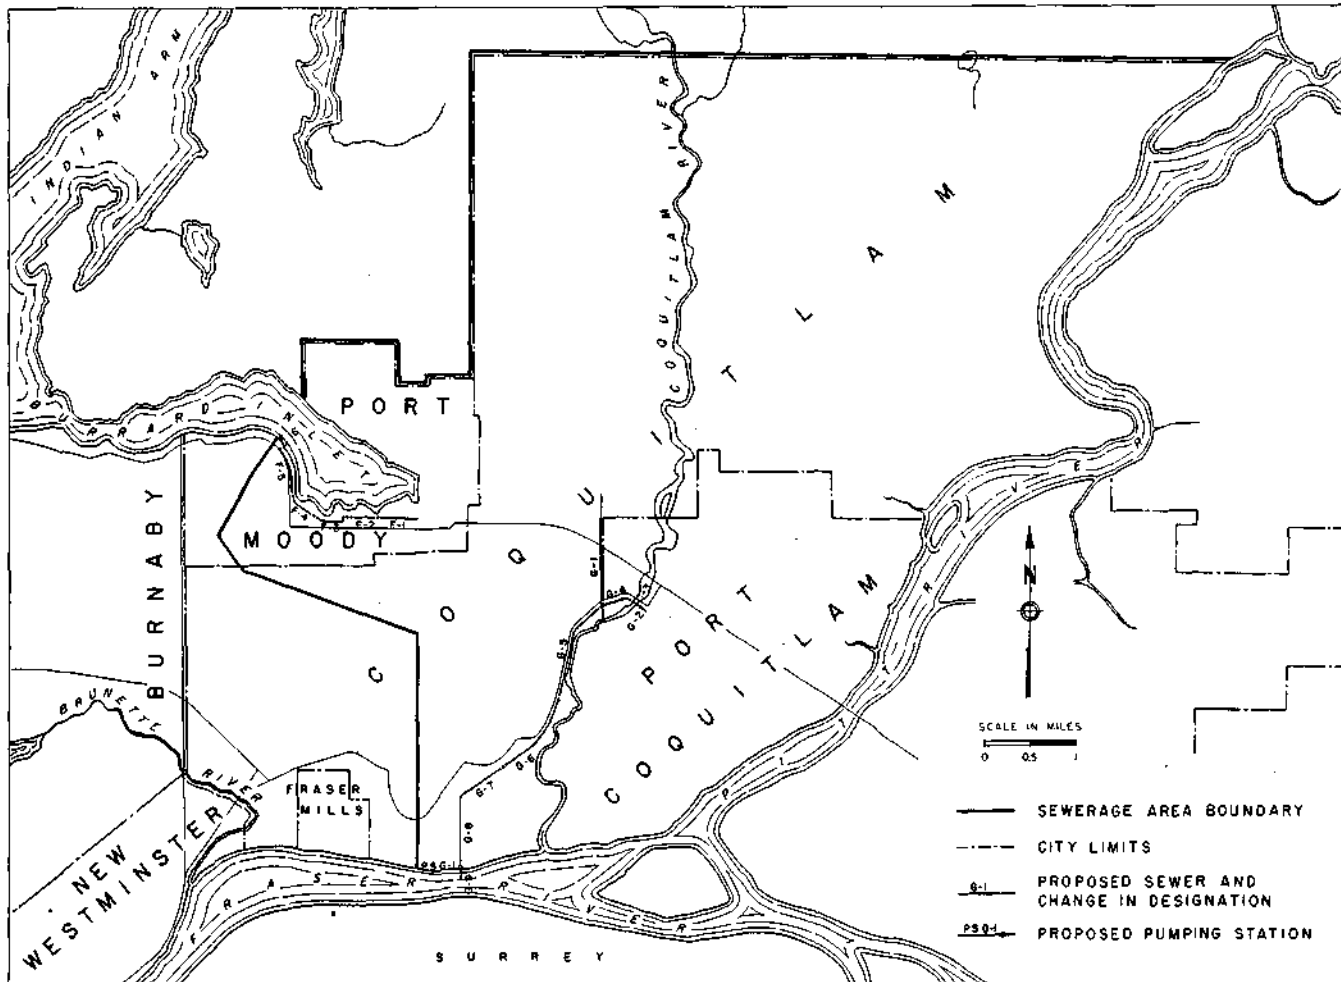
Proposed Layouts of Plan F and Plan G - Coquitlam Sewerage Area
